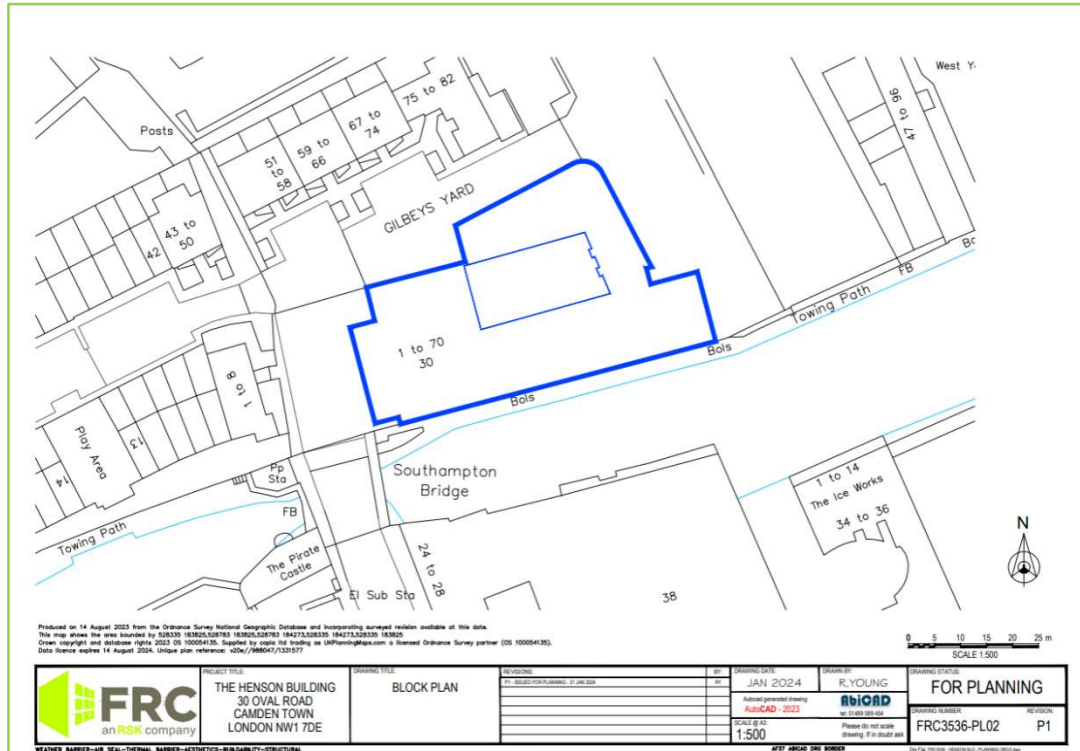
Blue outline denotes the subject buildings forming part of this application.
